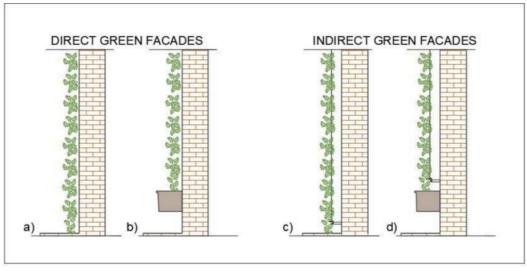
Different types of Green Facades: (a) Direct Green Facade with vegetation planted into soil; (b) Direct Green Facade with plants rooted in box; (c) Indirect Green Facade with vegetation planted into soil; (d) Indirect Green Facade with plants rooted in box (Palermo & Truco 2013)
